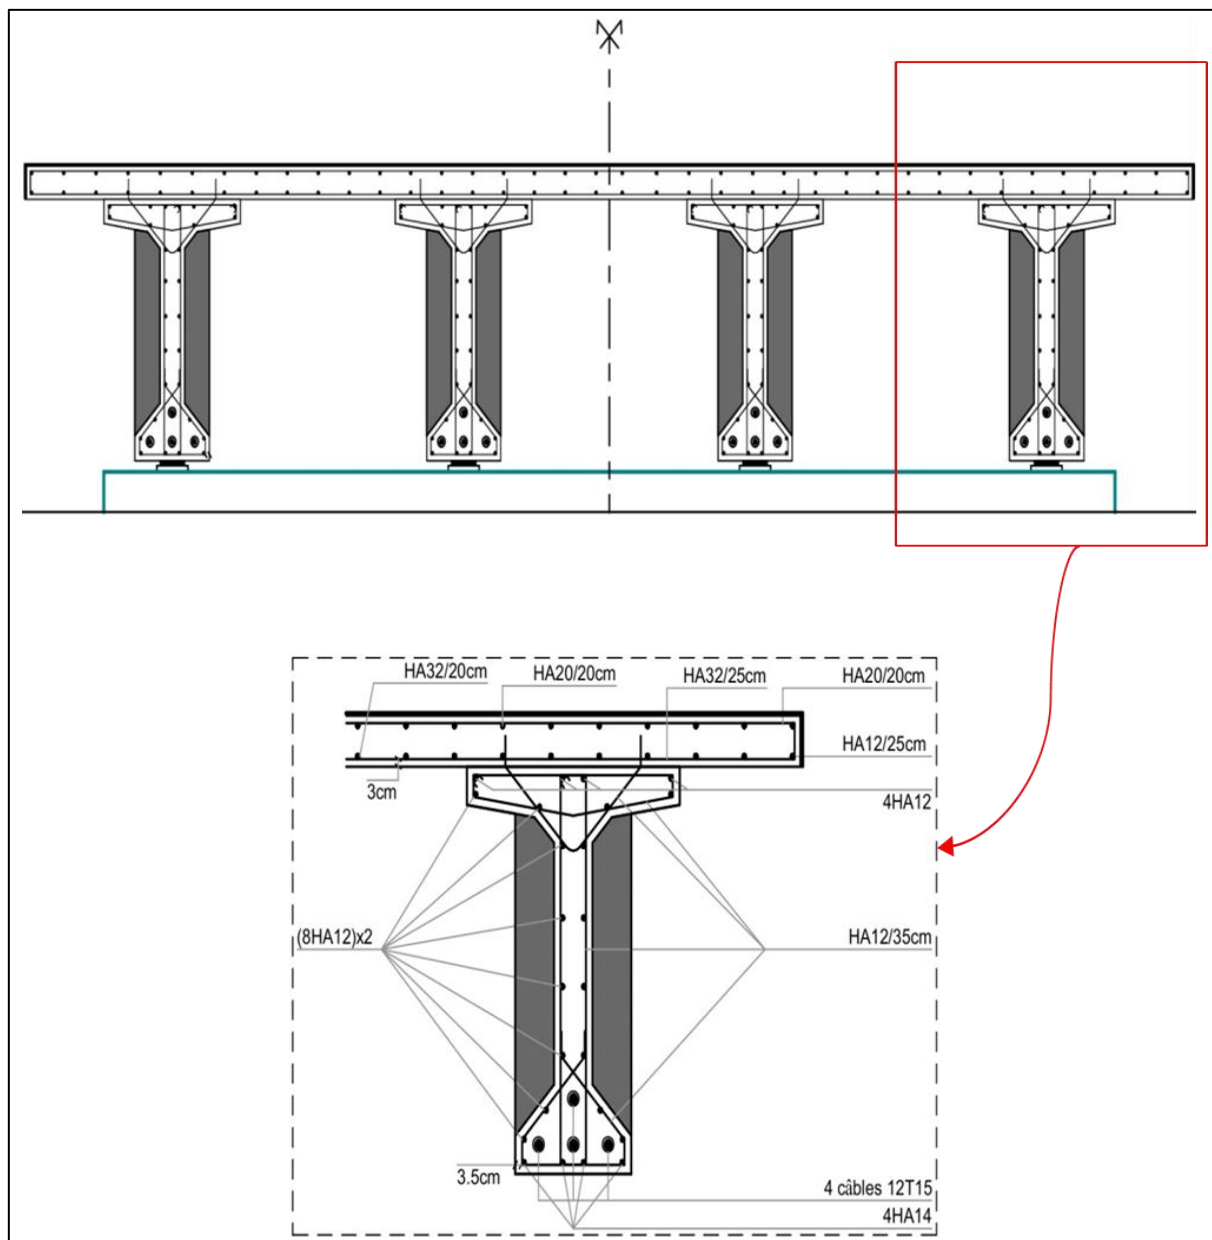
Final Reinforcement Layout of the Bridge Deck.
